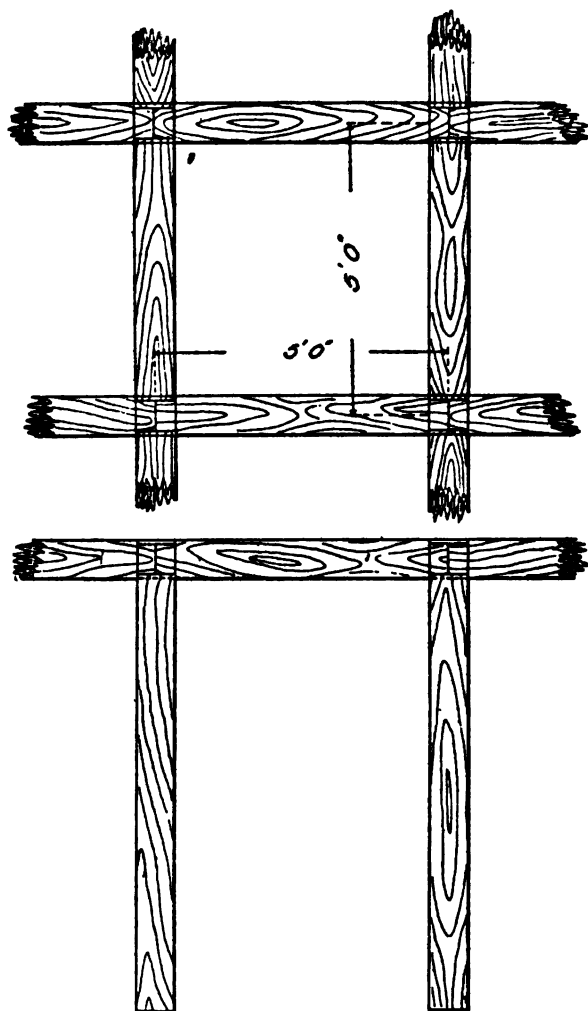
SQUARE SET. 8-IN. TIMBERS. PLAN AND ELEVATION.
